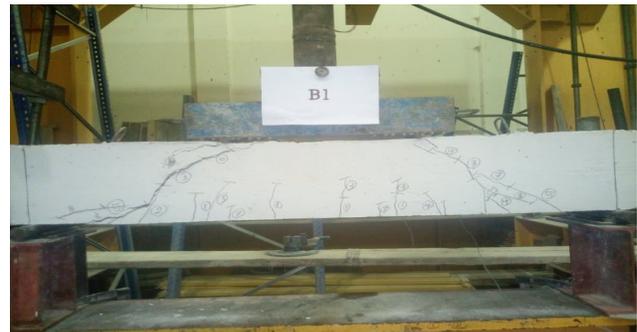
Crack Patterns of Control Beam(B1) Without Opening Without Strengthening.
